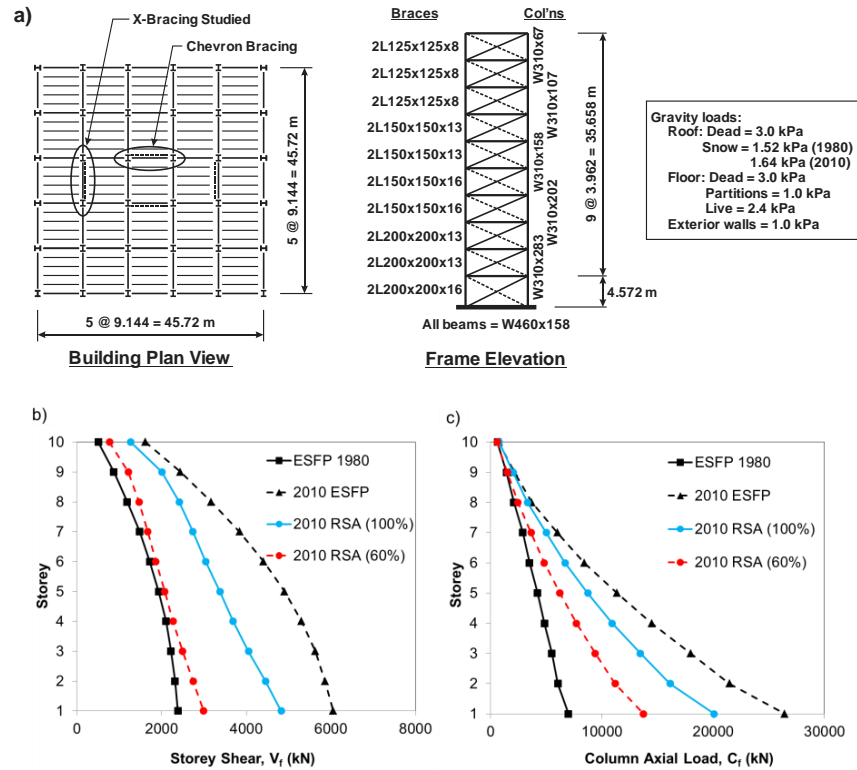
a) Plan view and braced frame elevations of the building studied; b) Design factored storey shear force per frame; and c) Design factored column axial loads.
